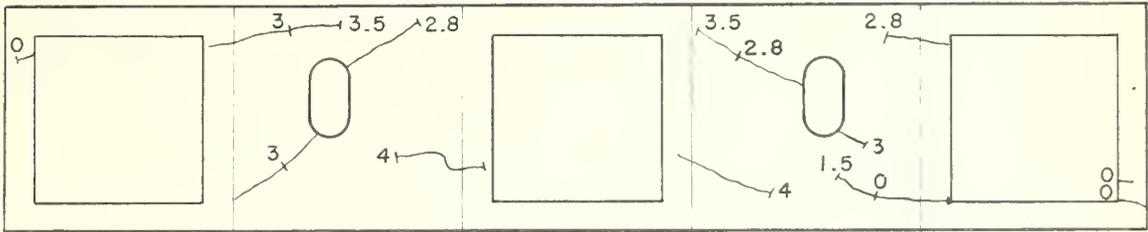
CRACK PATTERN IN BEAMS NO. 11 & 12
